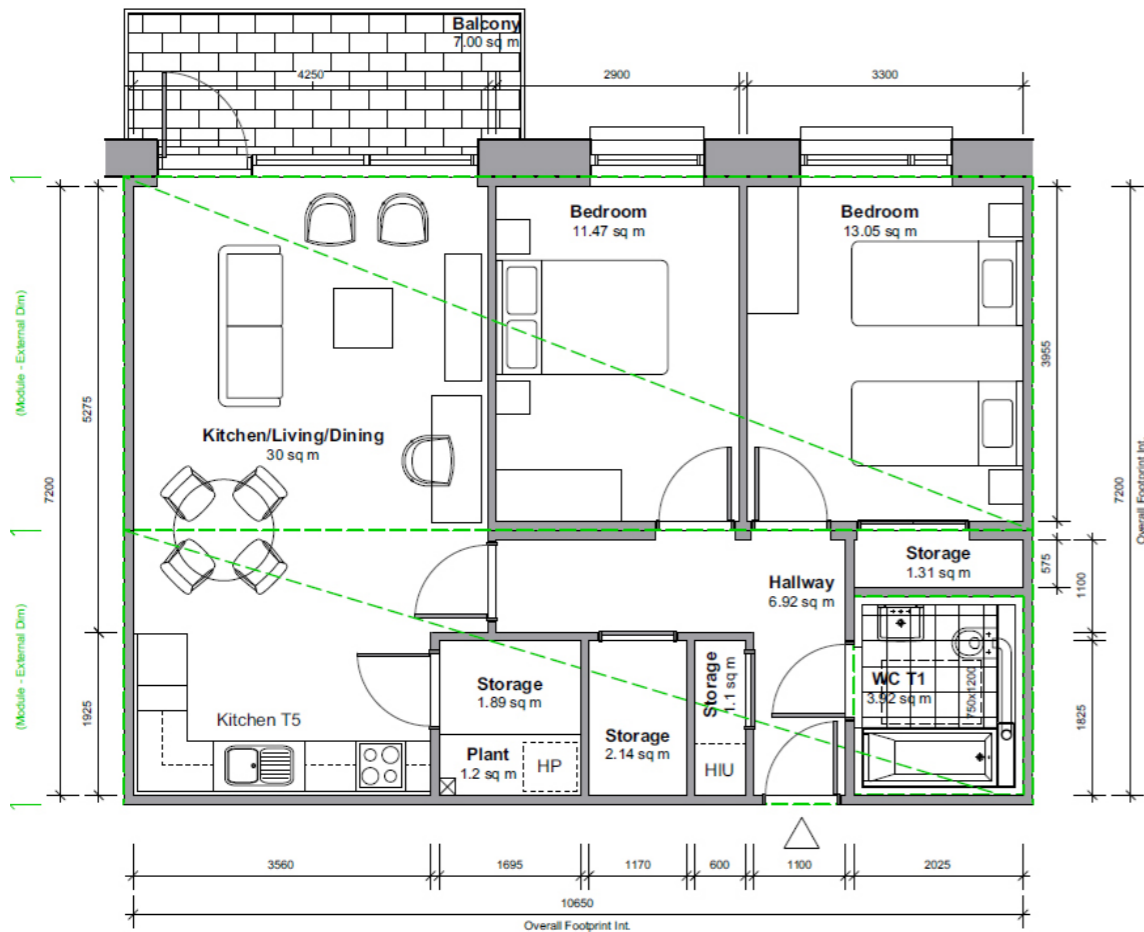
Apartment Type A-2B4P-1 Two Bedroom Apartment
